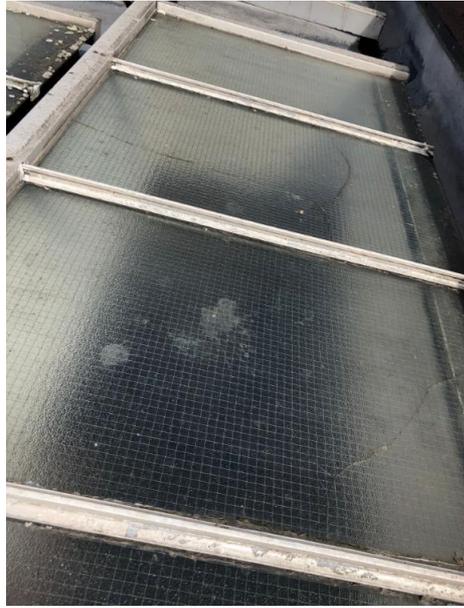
Further cracked glazing panels to roof lights to flat rubber membrane roof area above offices/kitchenette
